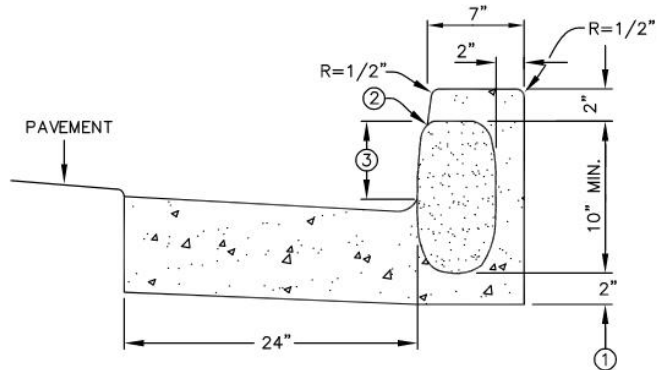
Exhibit K: Parkside District – Proposed Rock Curb Treatment
